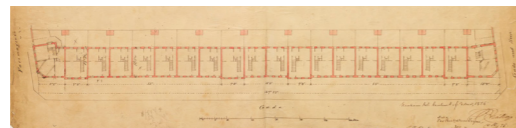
(above), floor plan of Kartoffelrækkerne
